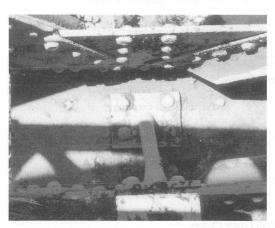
View looking down on lower chord of north truss showing blank rivets on outer plate of Upper Bridge at Slate Run
